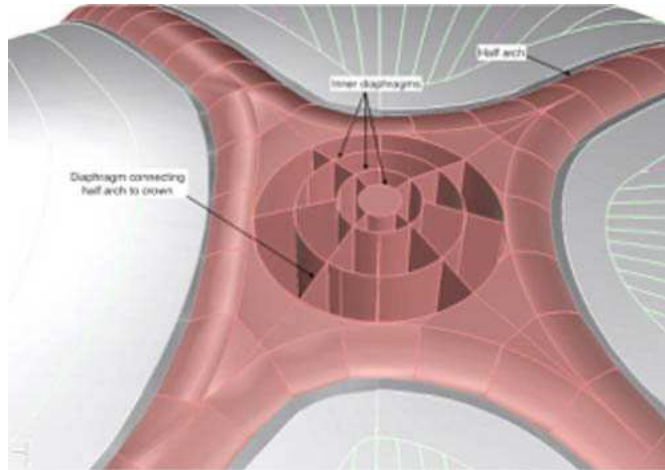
Sealed Tube Arrangement at Crown of Dome (Image by Barton Engineers)
